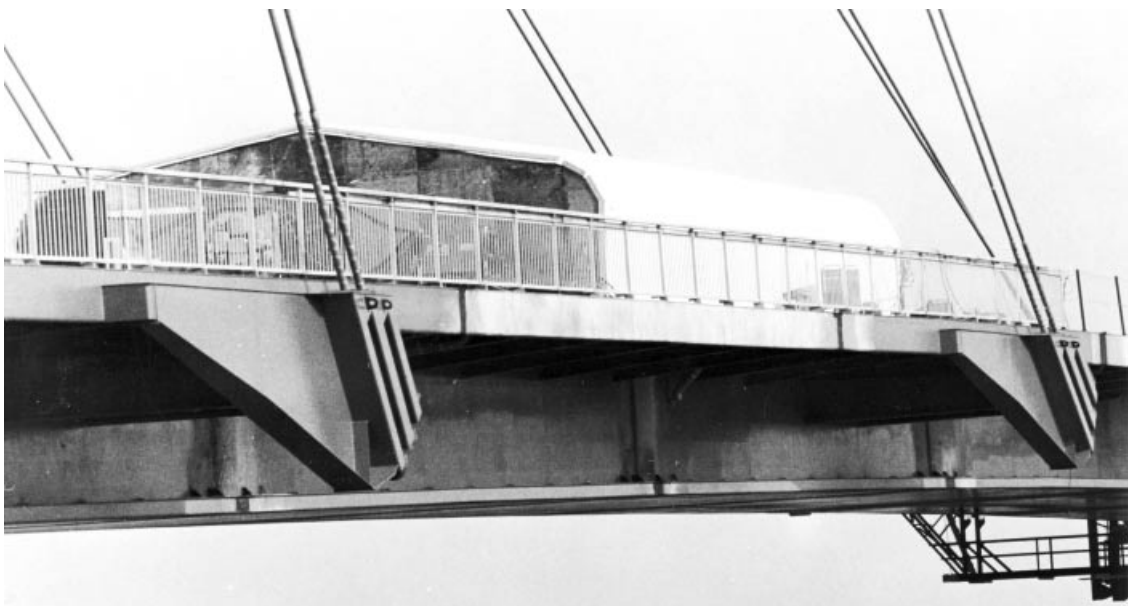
Inclined anchor girder in the Maracaibo Bridge
